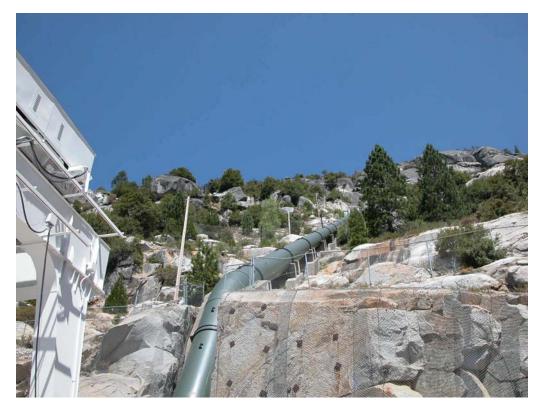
View of slope fence adjacent to French Meadows Powerhouse.
